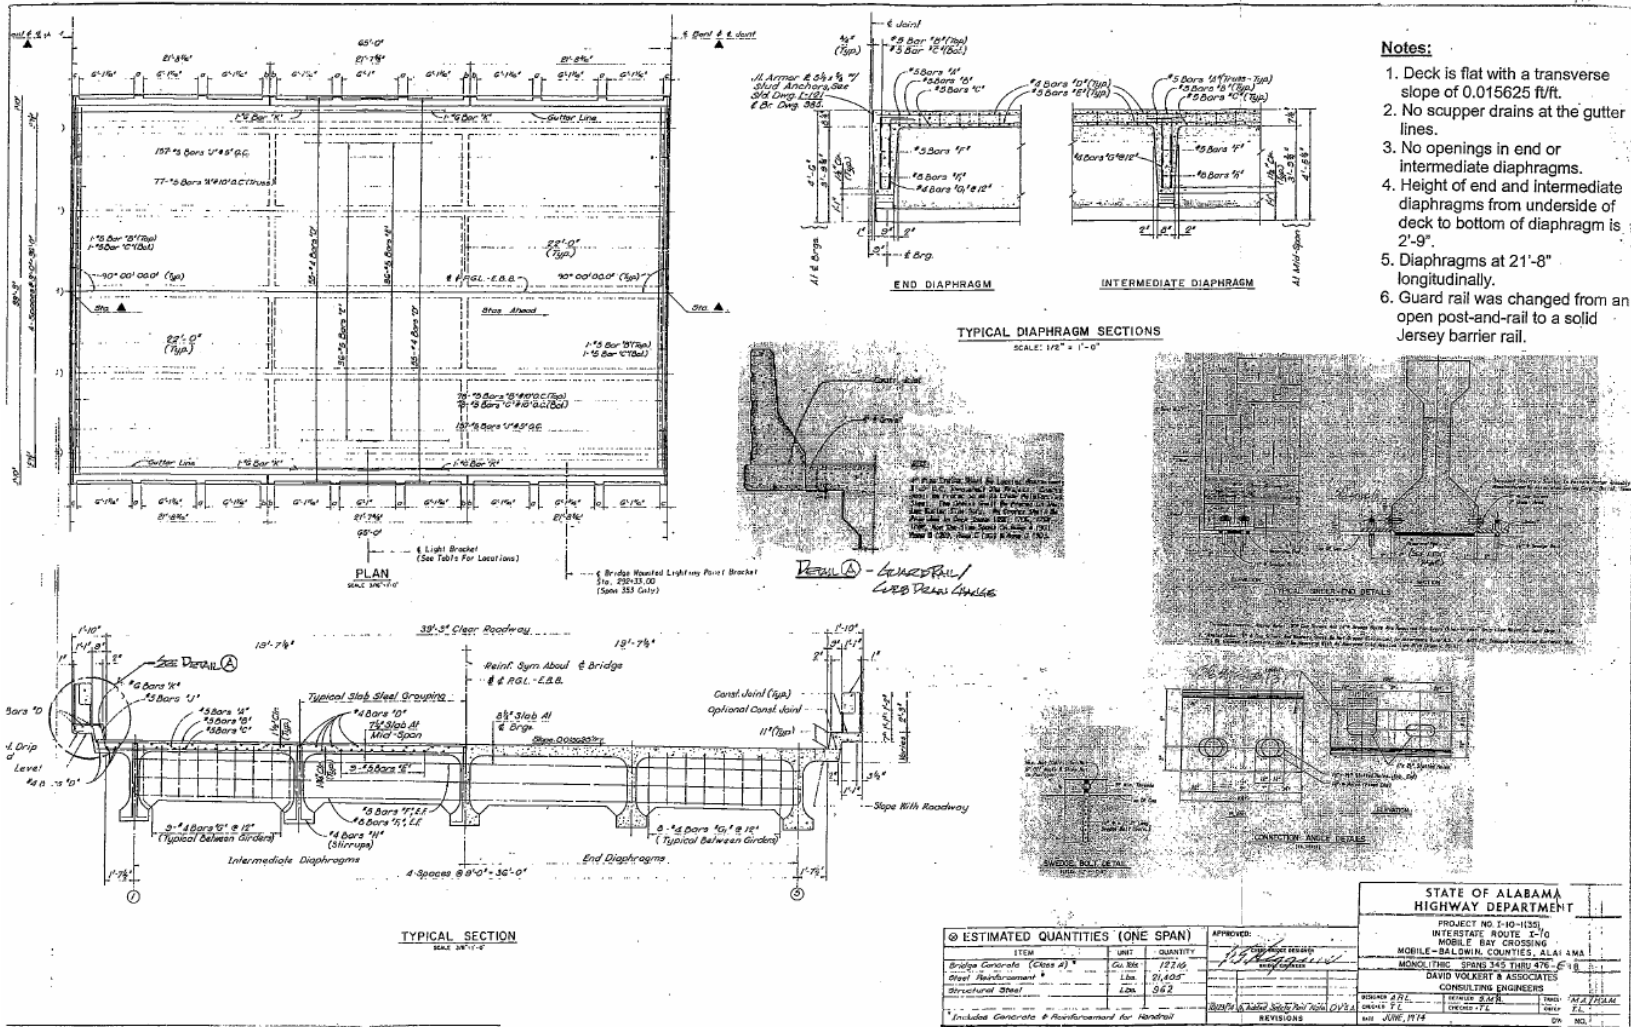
Superstructure Plan and Section of I-10 Bridge
